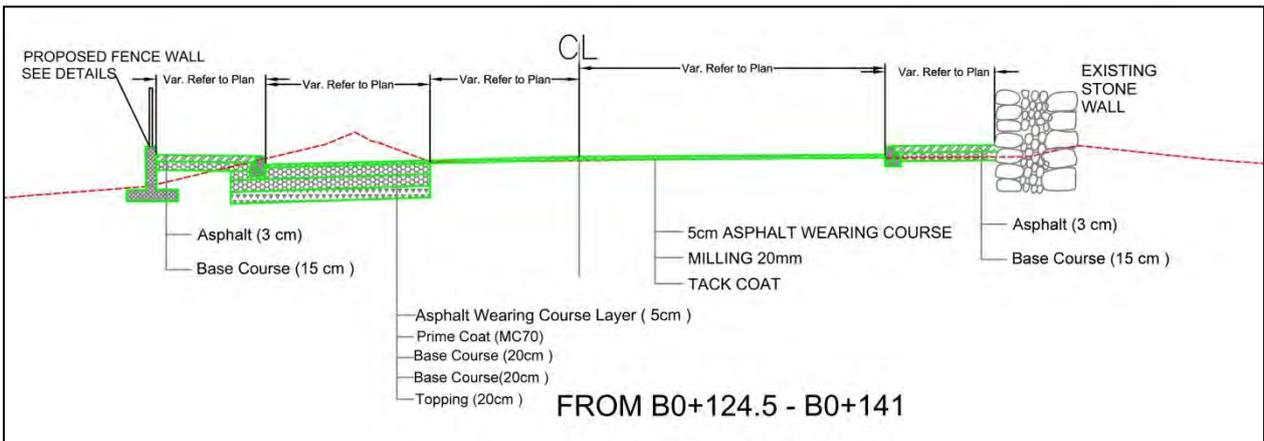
Project 07- HEB- Beit Nooon- Segment B- Typical cross section from St. B0+124.5 to St. B0+141
